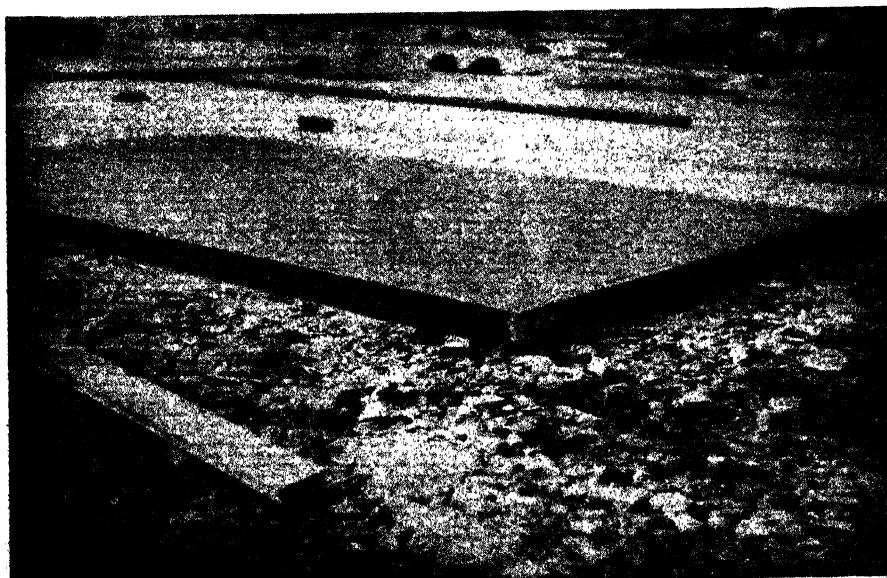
LAYING A GRANOLITHIC FLOOR (4)
